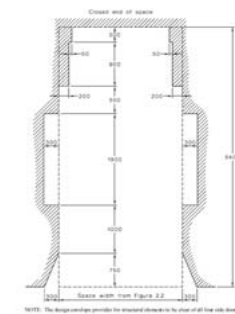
DESIGN ENVELOPE AROUND PARKED VEHICLE TO BE KEPT CLEAR OF COLUMNS, WALLS AND OBSTRUCTIONS
